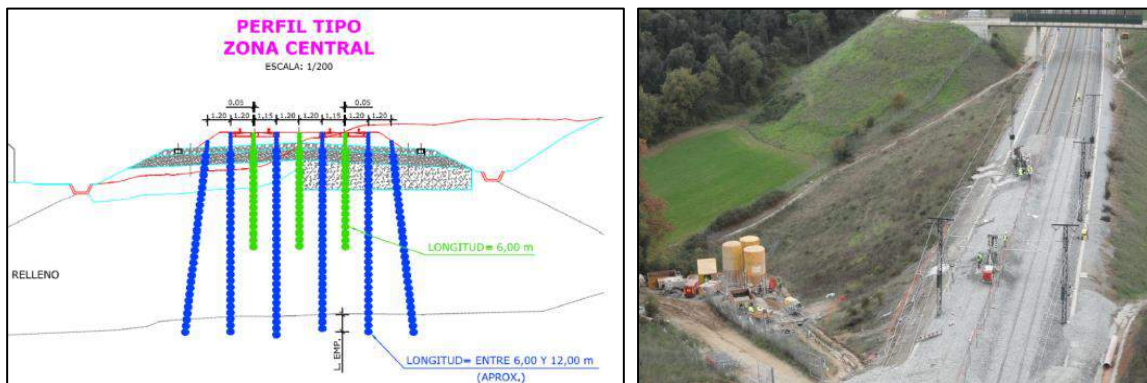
and 5. Adopted solution: Typical section; compaction grout equipment and installation.
